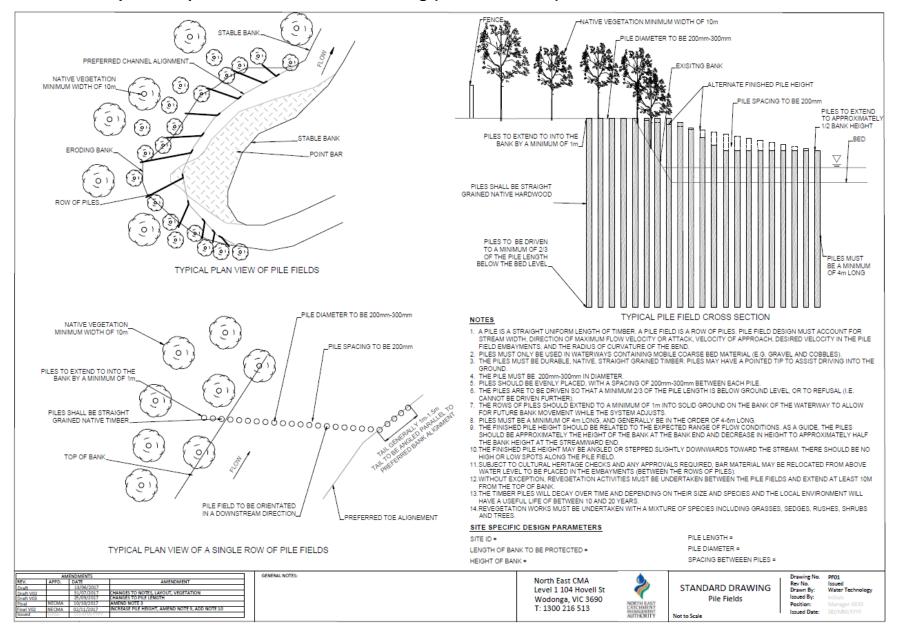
Standard pile field plan and cross-section drawing (Source NECMA).
